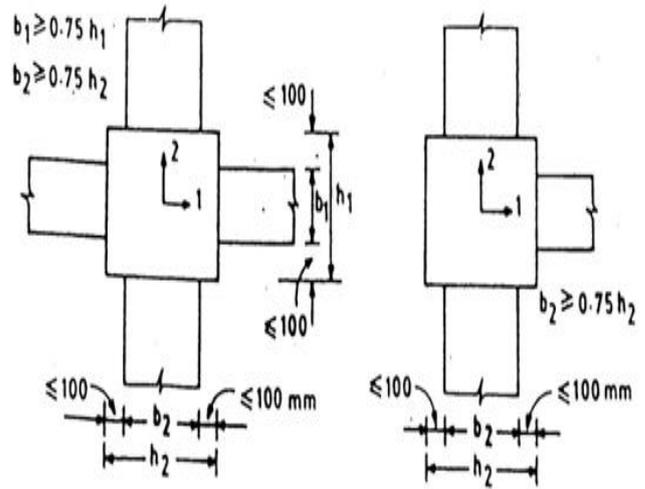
Transfer of Force Through a Beam Column Joint
